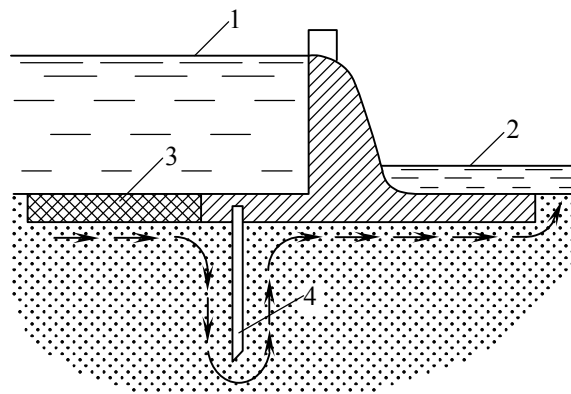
Injectable concrete rocks on a sandy basis: 1 – the upper level of water; 2 – lower water level; 3 – pound; 4 – plywood wall
